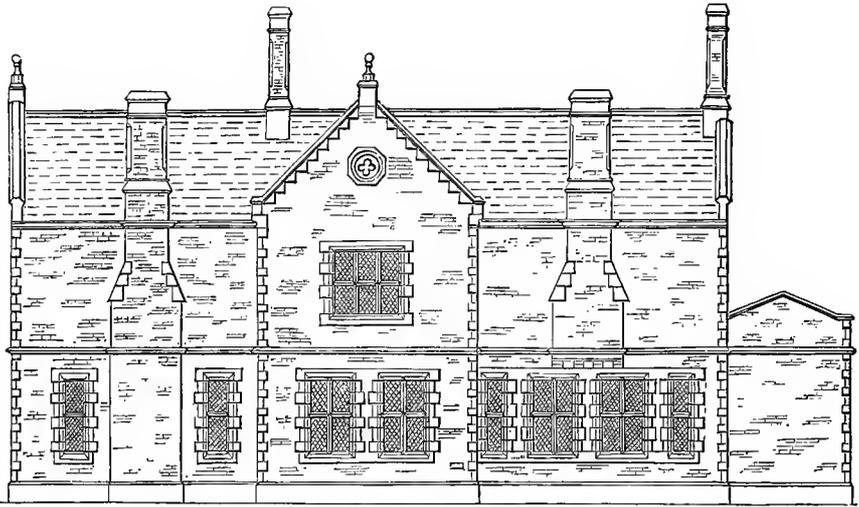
Side elevation of farmhouse, finished to show stone-rubble walling—scale in Plate VIII.
